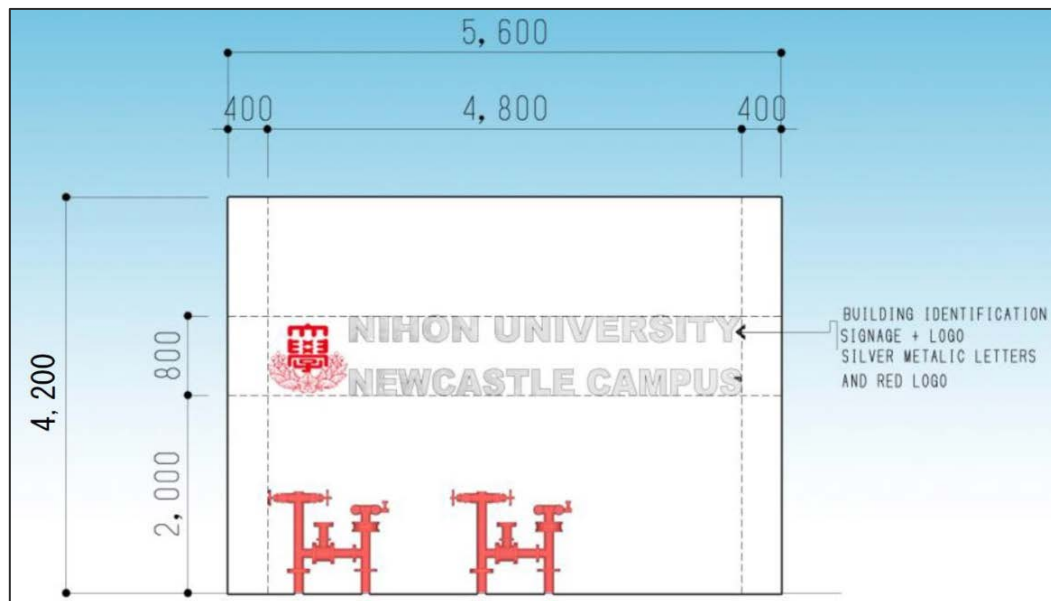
| Proposed Building Identification Sign (Source: Azusa Sekkei 2019)
